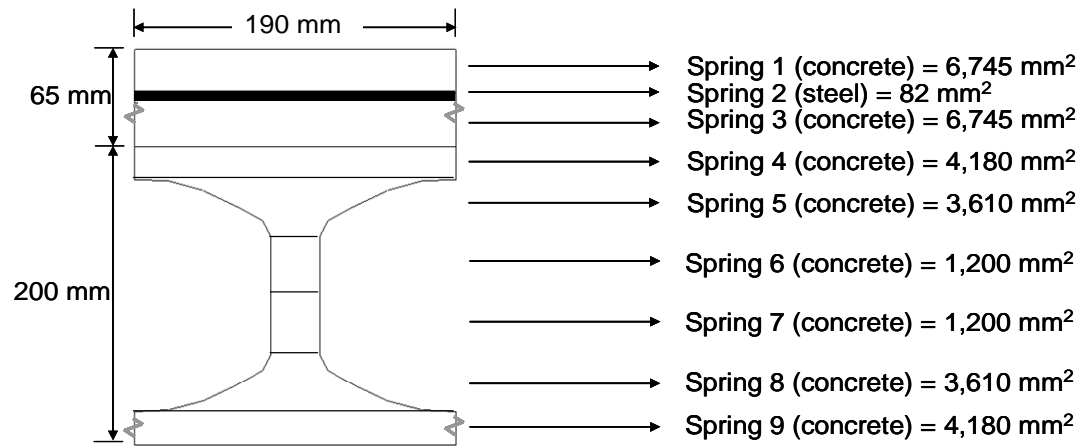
Division of the hollowcore slab cross section for Matthews' connection (white segment: concrete; black segment: steel)
